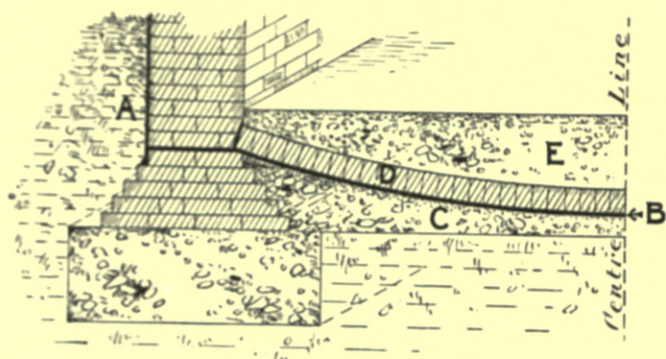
Asphalted Floor and Wall to resist considerable Pressure of Water.
